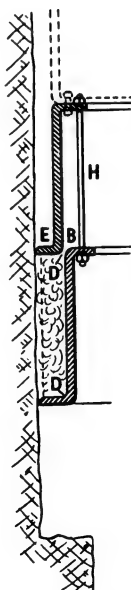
Section of part of the Moss-Box and Bottom Ring of Tubbing, showing Arrangement of Flanges.
